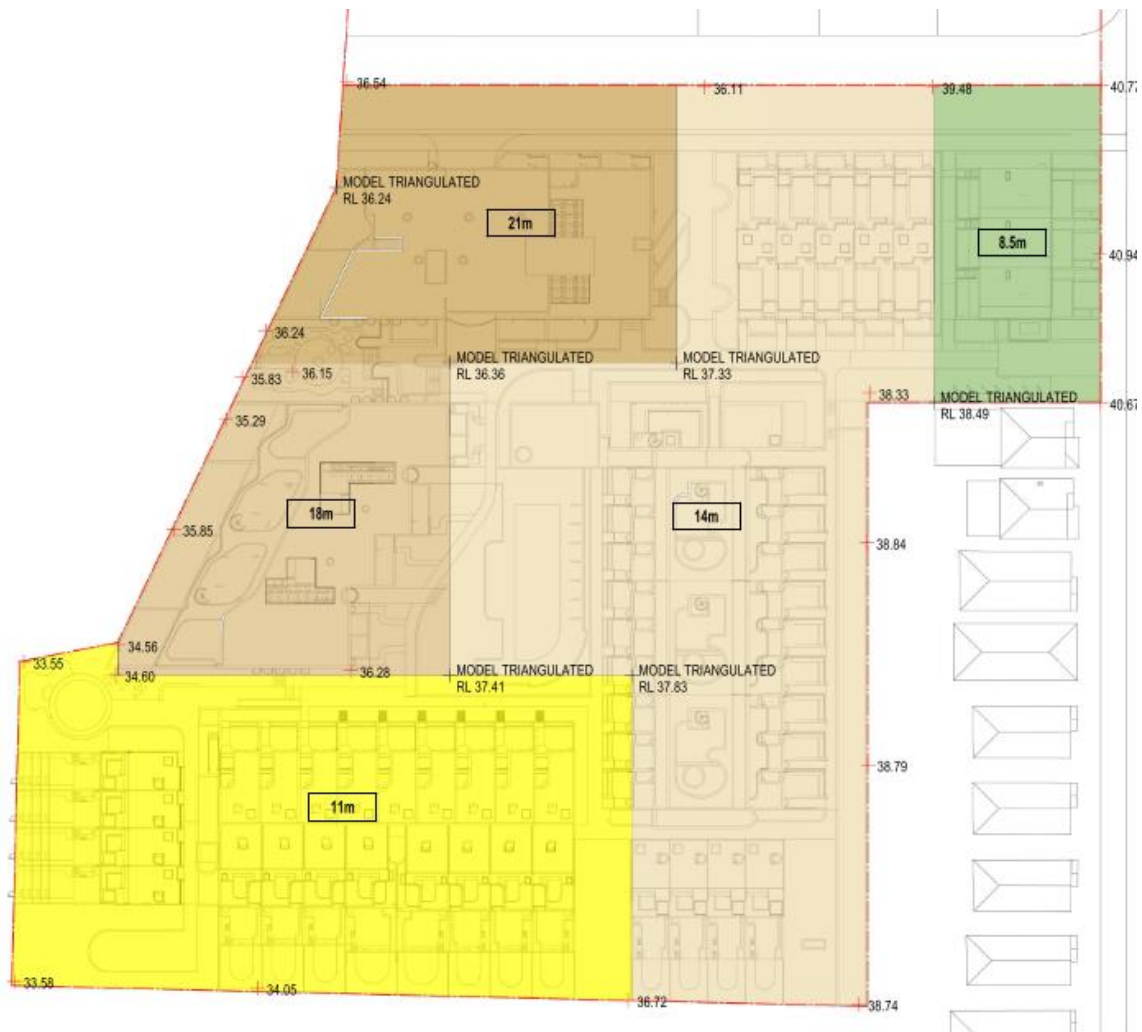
CLEP Height Map over proposed buildings. Source: SJB architectural plans
